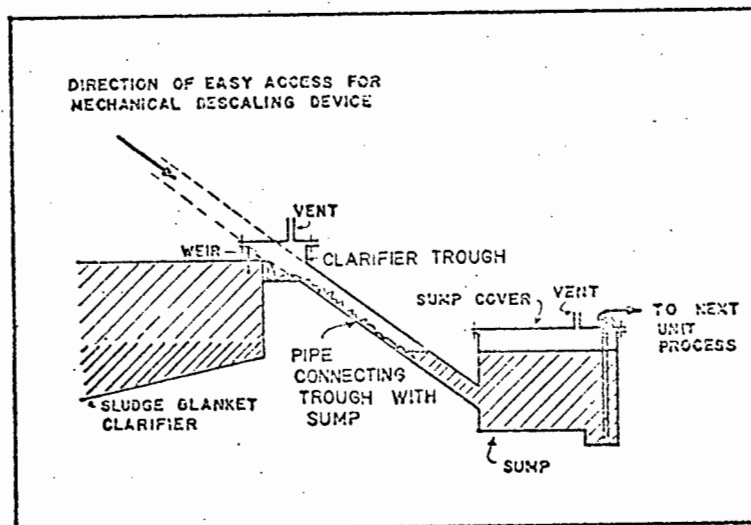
Suggested design for an accessible pipe connecting the clarifier trough and sump
